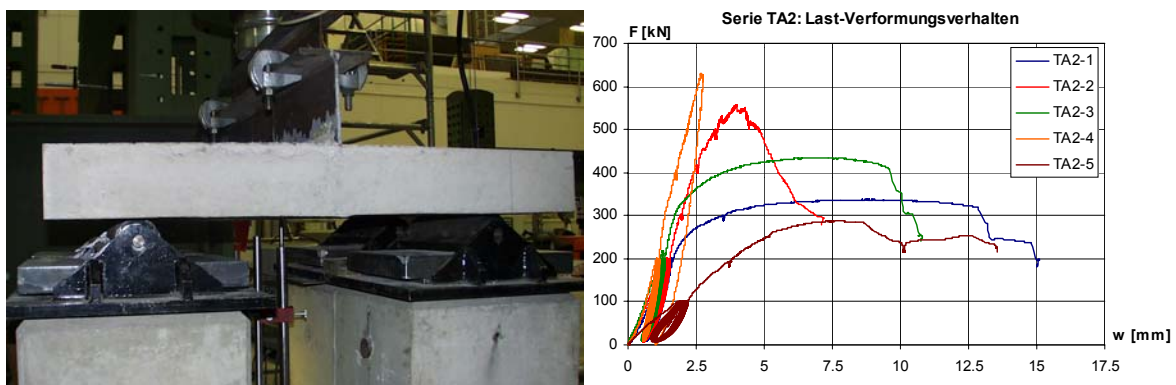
Girder section tests for examination of local stress effects in concrete slabs under transversal load transmission over the upper web edge of upper flangeless standard steel profiles
